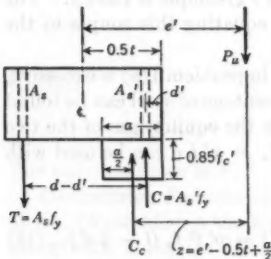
FORCES IN EQUILIBRIUM, TENSION FAILURE OF COLUMN
